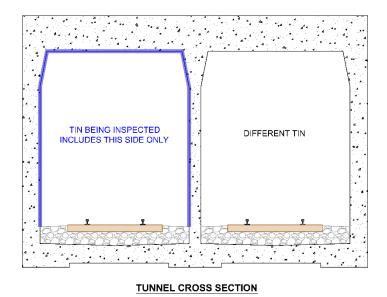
Element Qty Boundary: Liner (SF - Rectangular / Box)
